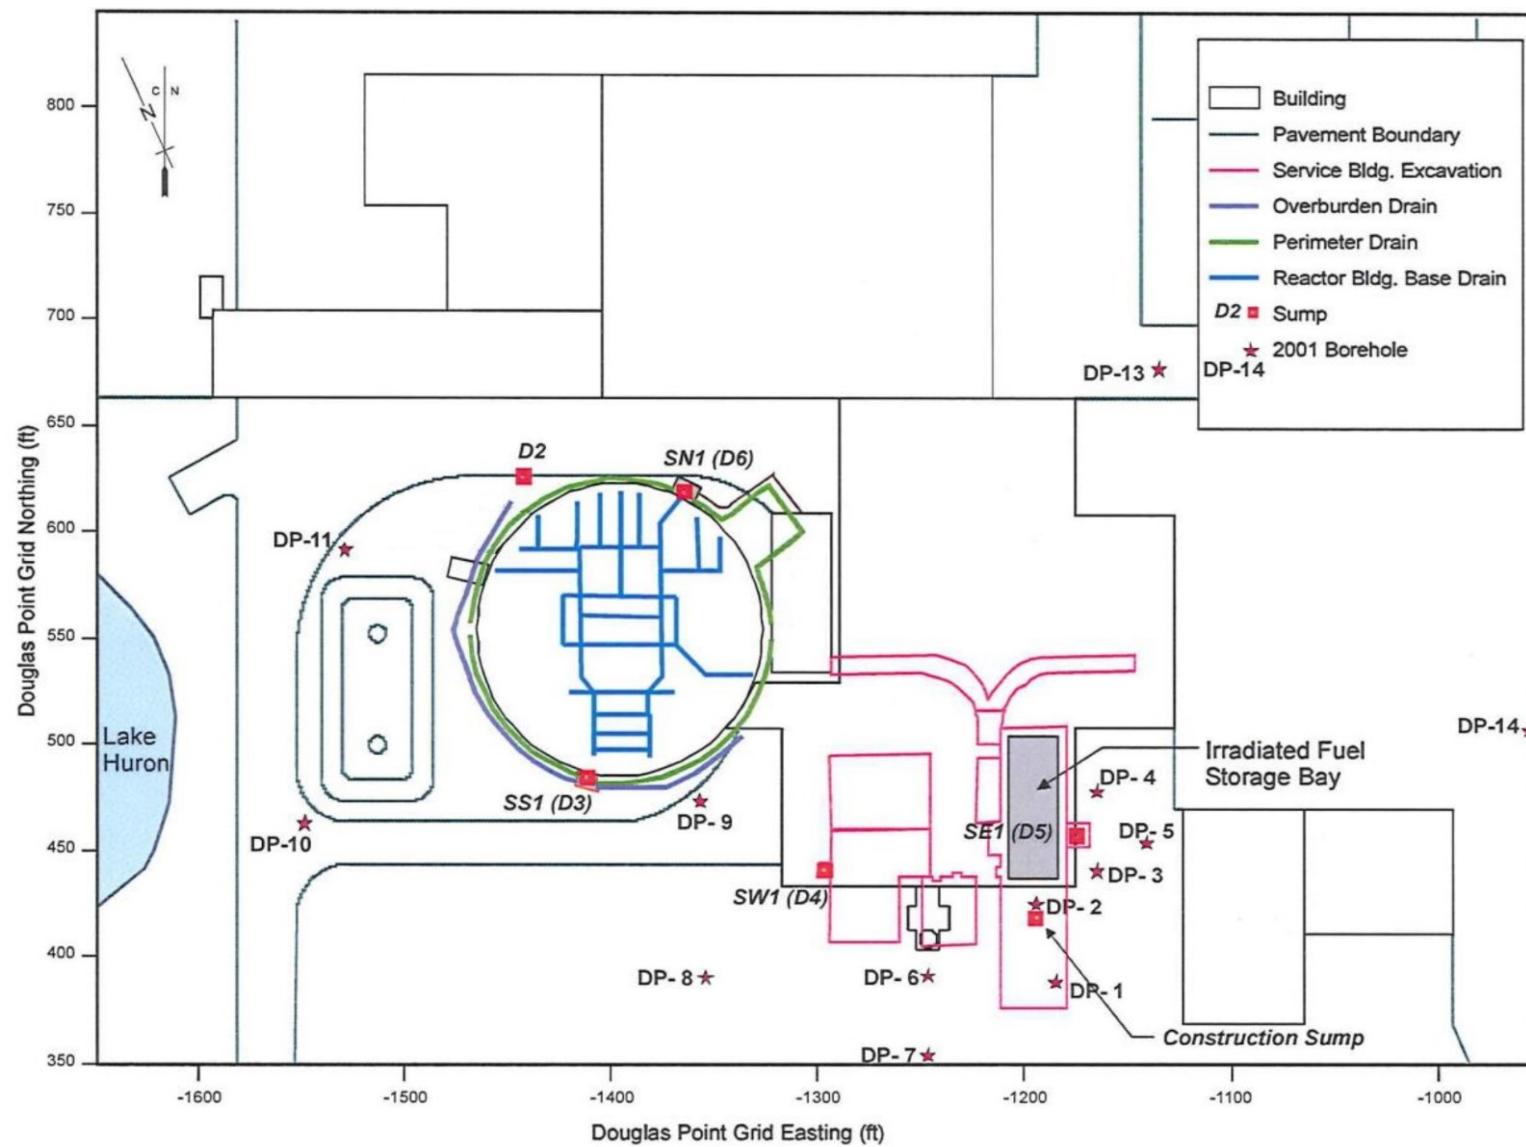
Reactor Building & Service Building Sub-Surface Drainage Systems (CNL 2021a)
